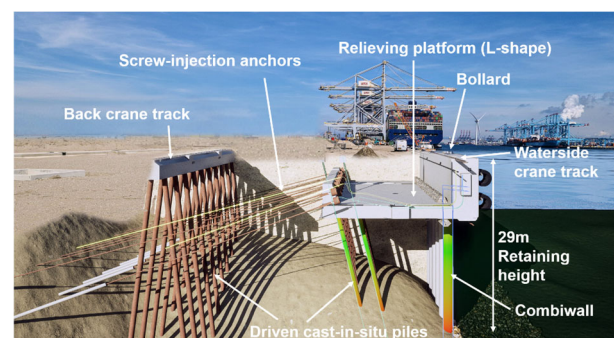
Cross-section of deep-sea quay wall at Amaliahaven.
